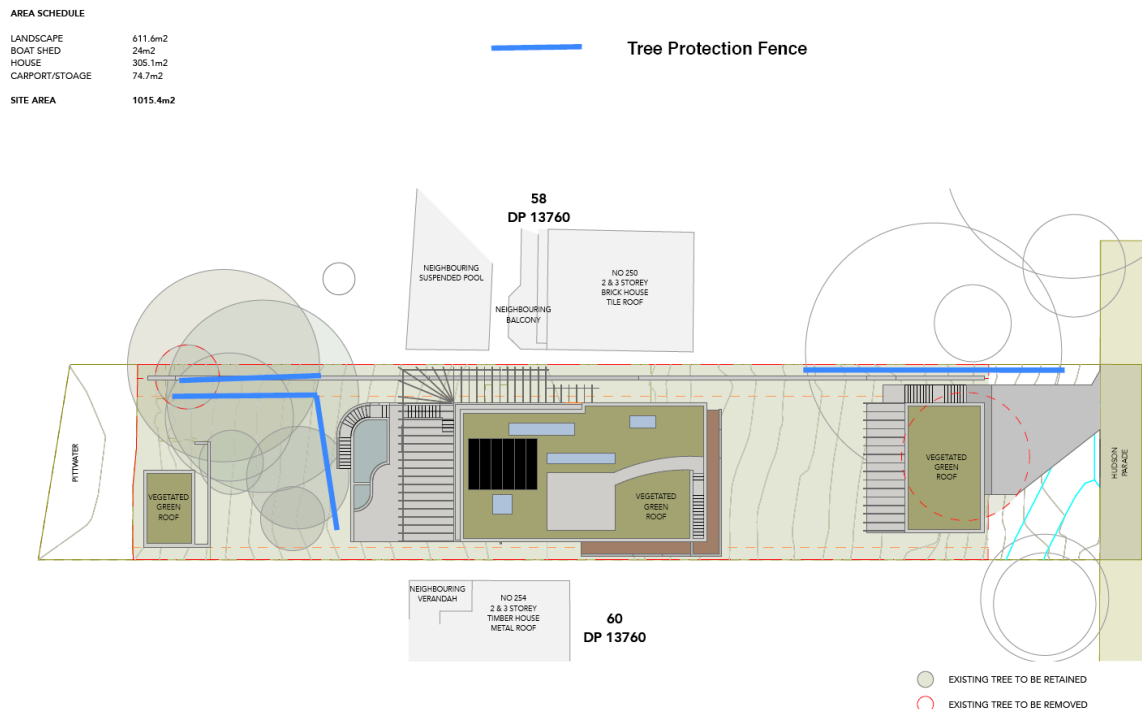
Trees and contours. Note the site slopes to Pittwater.
